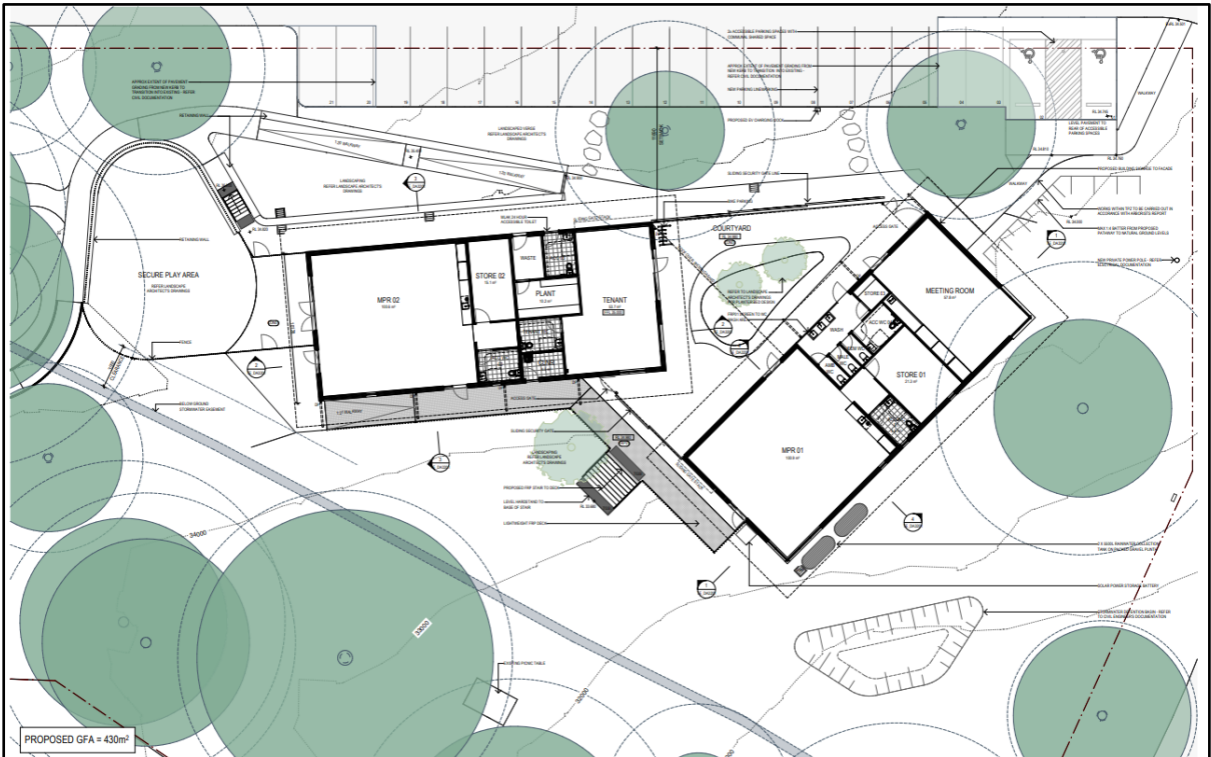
Proposed Ground Floor Plan. Source: AJC Architects dated 23 April 2024.
